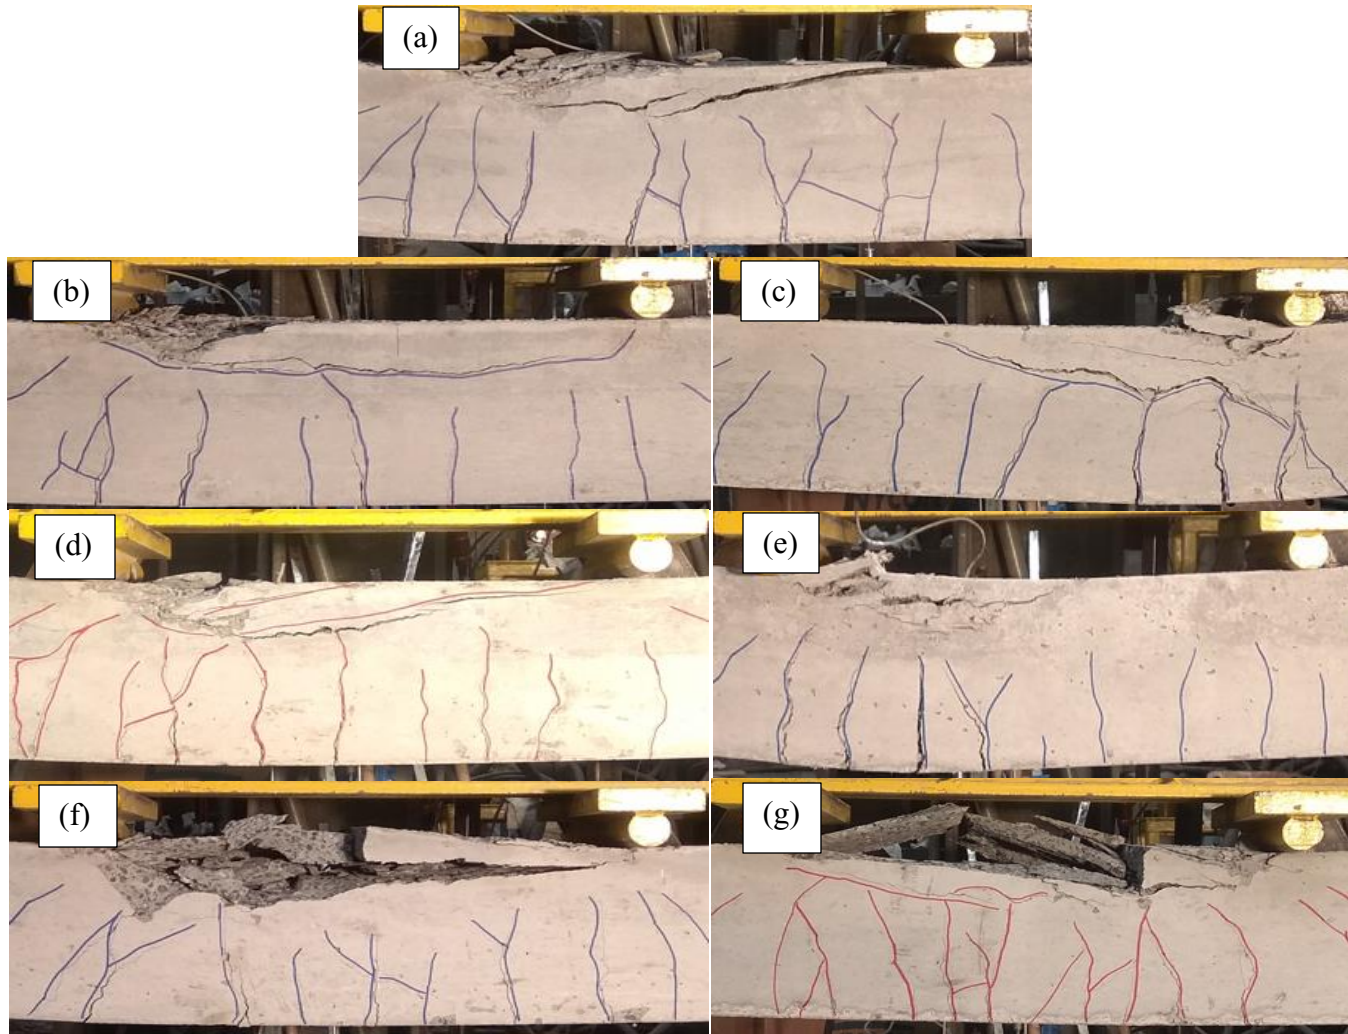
Crack patterns for all tested beams at failure stage (crack widths in mm).
